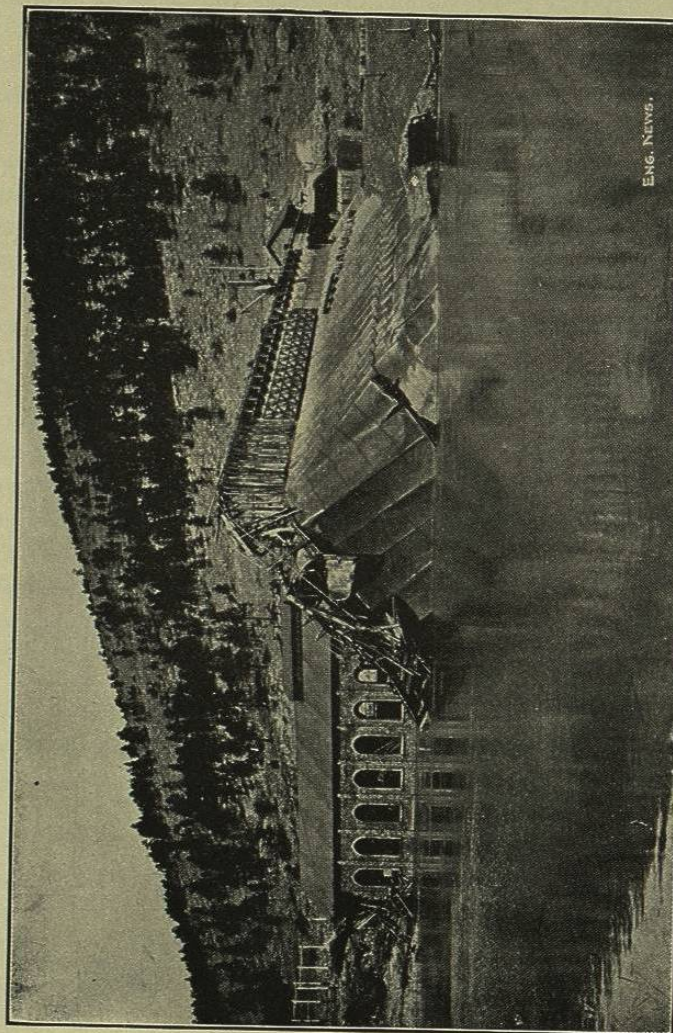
HAUSER LAKE DAM AS IT APPEARED APRIL 15, 1908.
